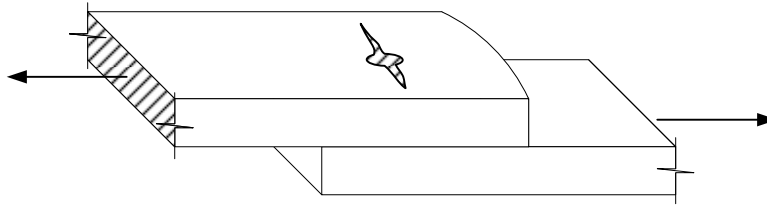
Tensile Failure of a Connected Element by Net Section Fracture
